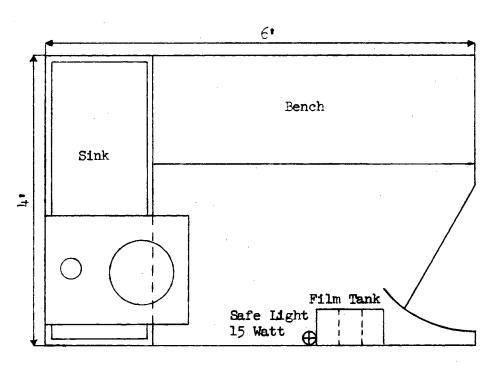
DARKROOM FLOOR PLAN - SAPULPA DAILY HERALD. (SCALE 3/4" = 1")
